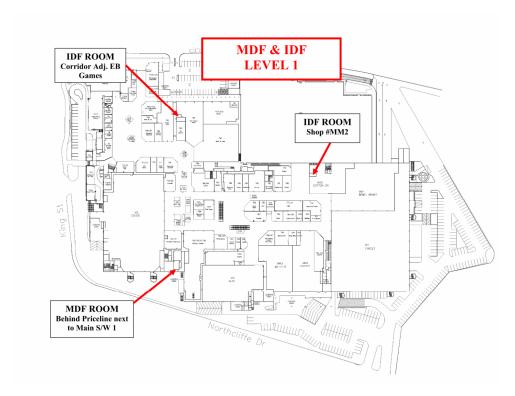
Critical Isolation Plan Level 1 Showing IDF Rooms
